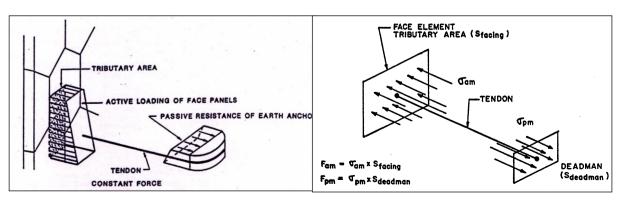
AND 45: MULTI-ANCHORED DEADMAN FILL RETAINING SYSTEMS, ANCHORED DEADMAN SYSTEM: TYPICAL COMPONENTS
